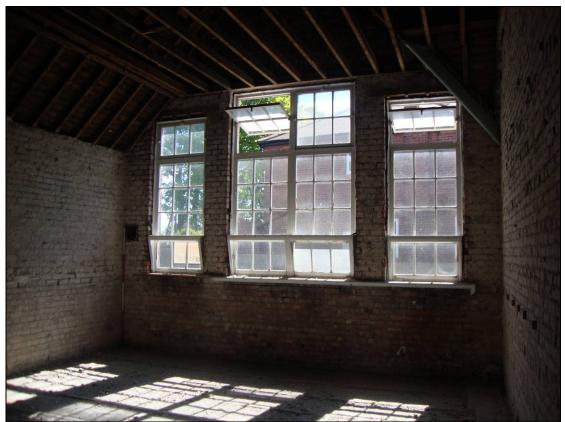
East elevation of Room 10, looking east. Scale = 2m
